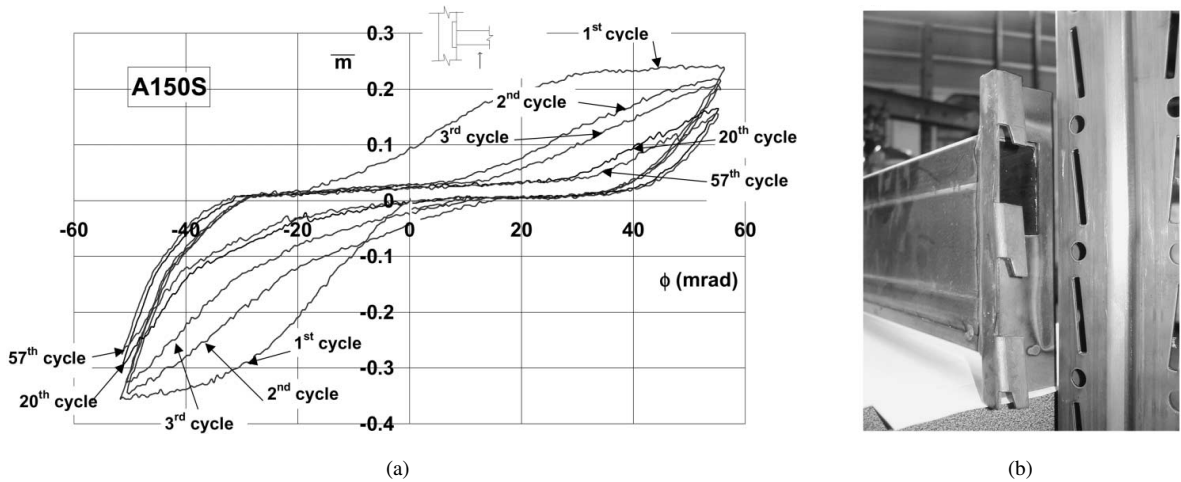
Examples of cyclic $\bar{m}-\phi$ relationship for beam-to-column rack joints (a), and connection details (b) [10]
